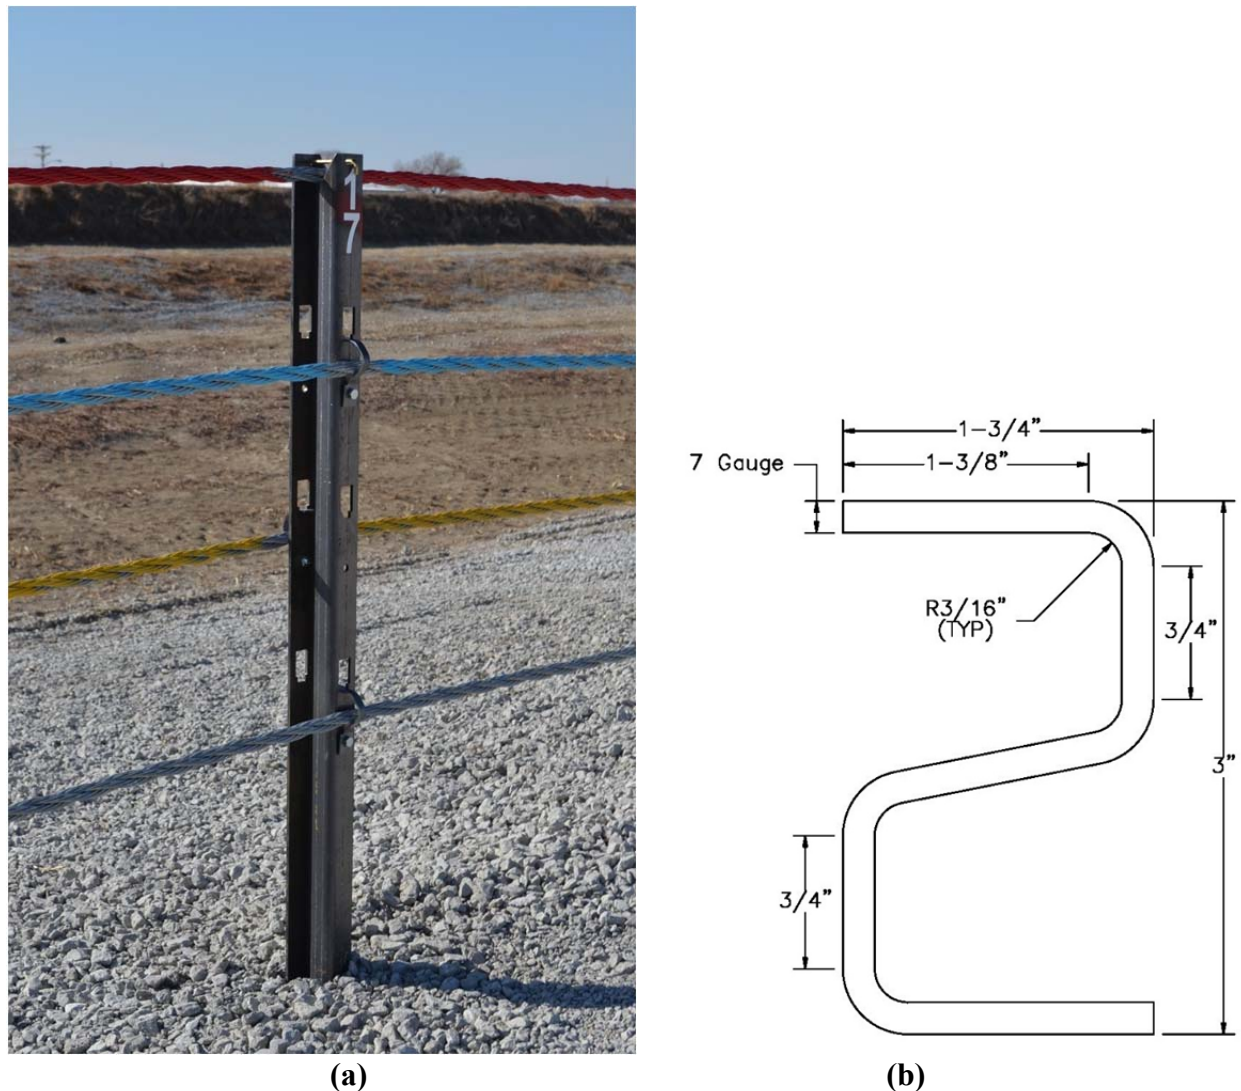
Modified Four-Cable, Median Barrier System with 40-in. Top Cable [Test No. MWP-1]: (a) Alternating Cables and (b) Cross-Sectional Geometry at Base.
